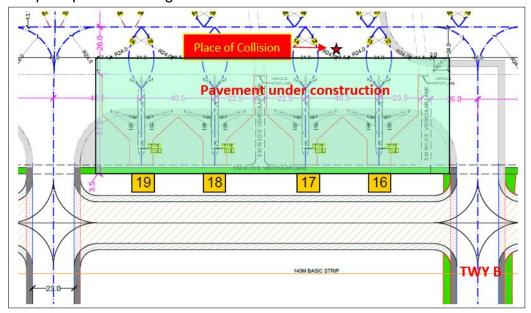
Place of collision and the under-construction pavement depicted in the approved apron proposed marking layout chart
